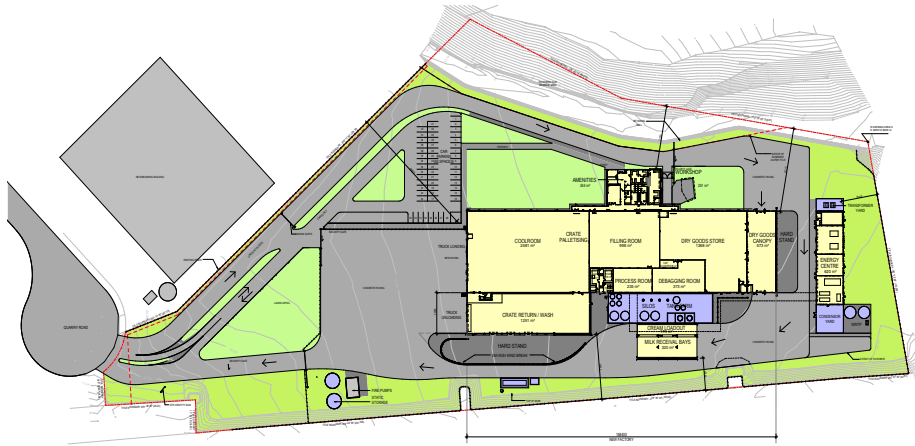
Layout Plan Source: Blomquist+Wark Architects
